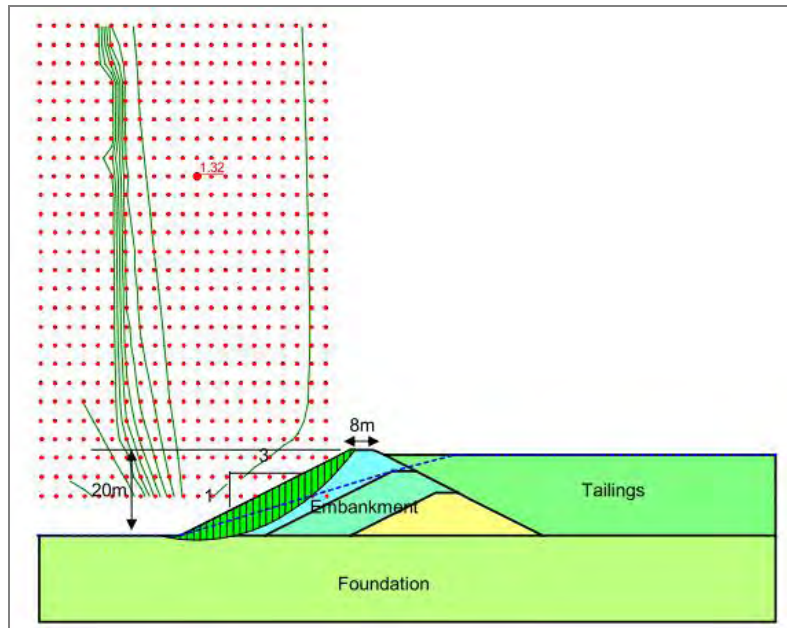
Phreatic surface within embankment dam and TSF (Pseudo Static)
